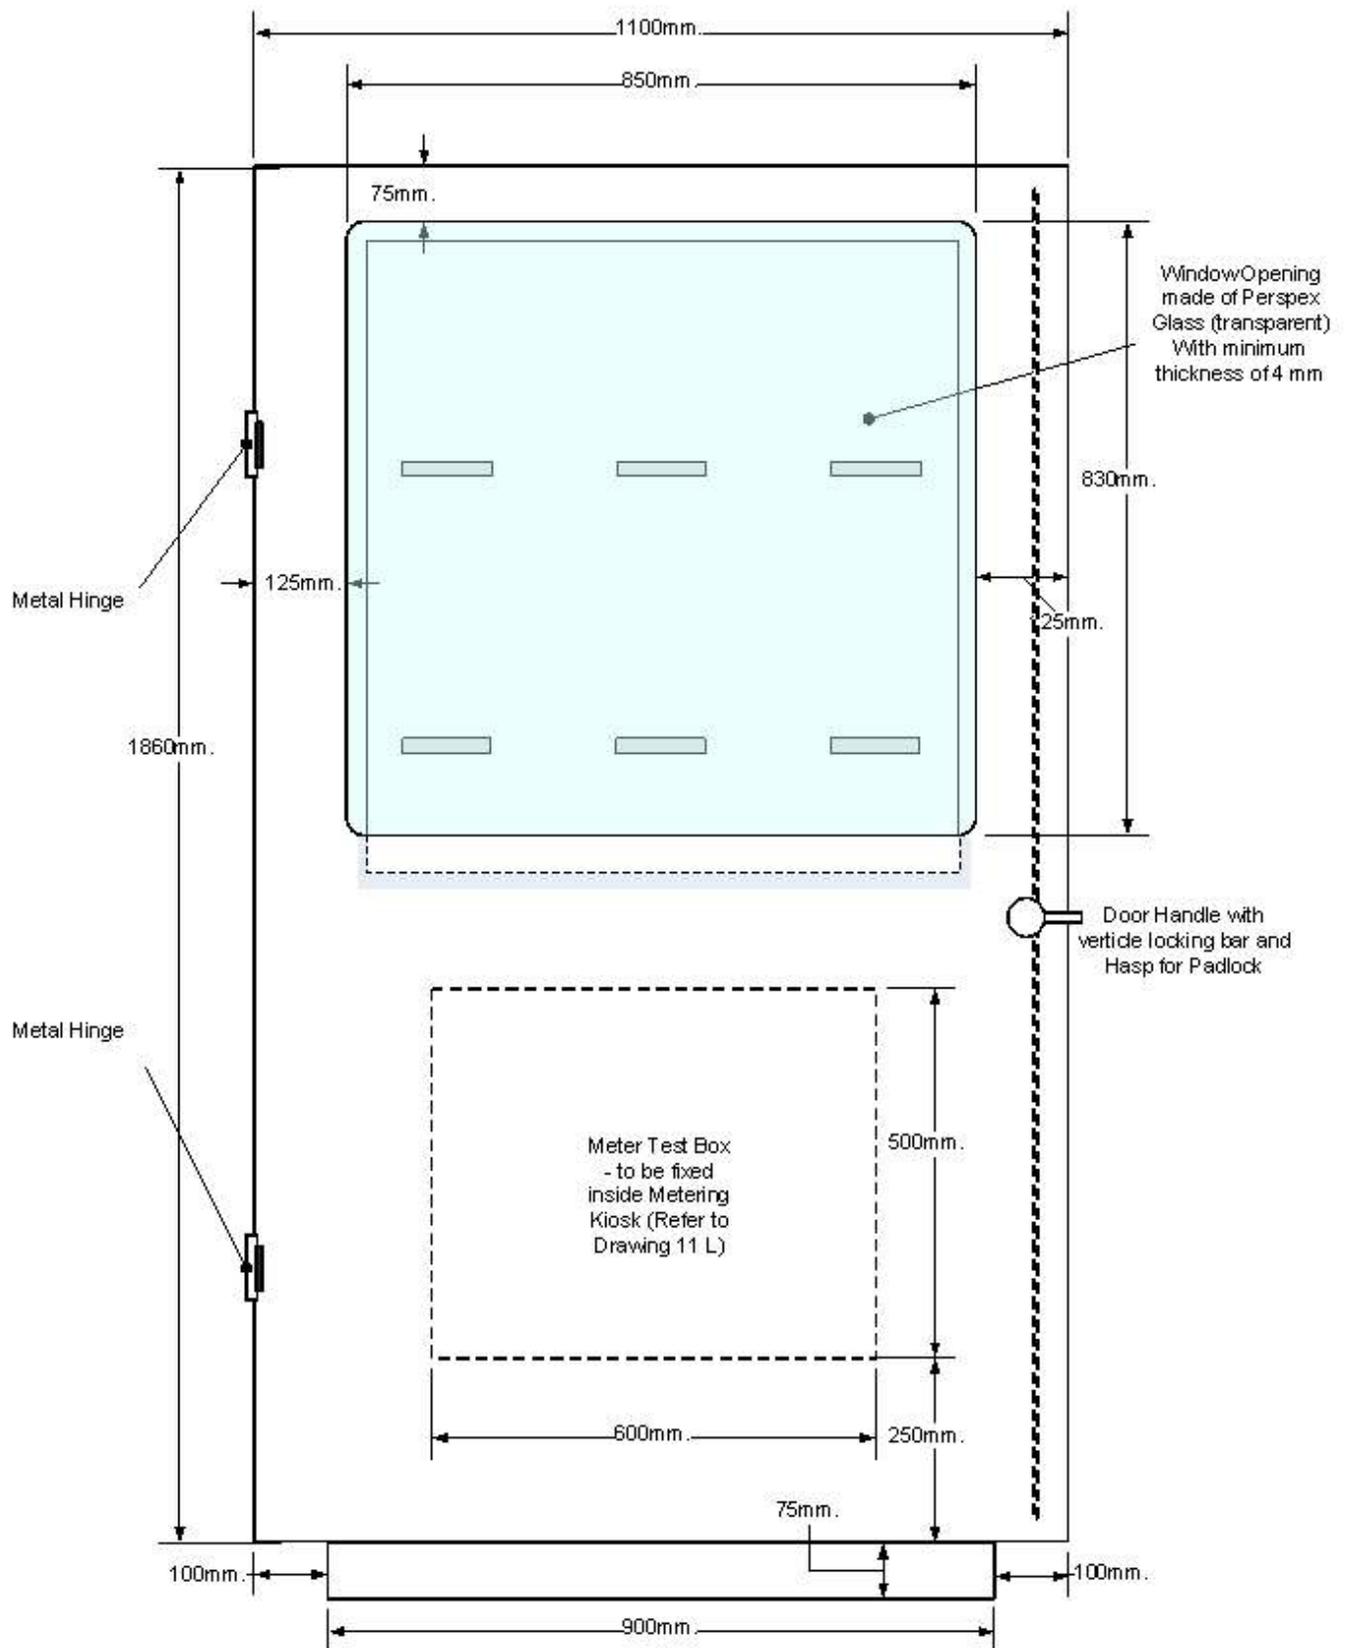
C : MV/HV, 1 OR 2 FEEDER METERING KIOSK : Internal Door – Perspective & Side View
